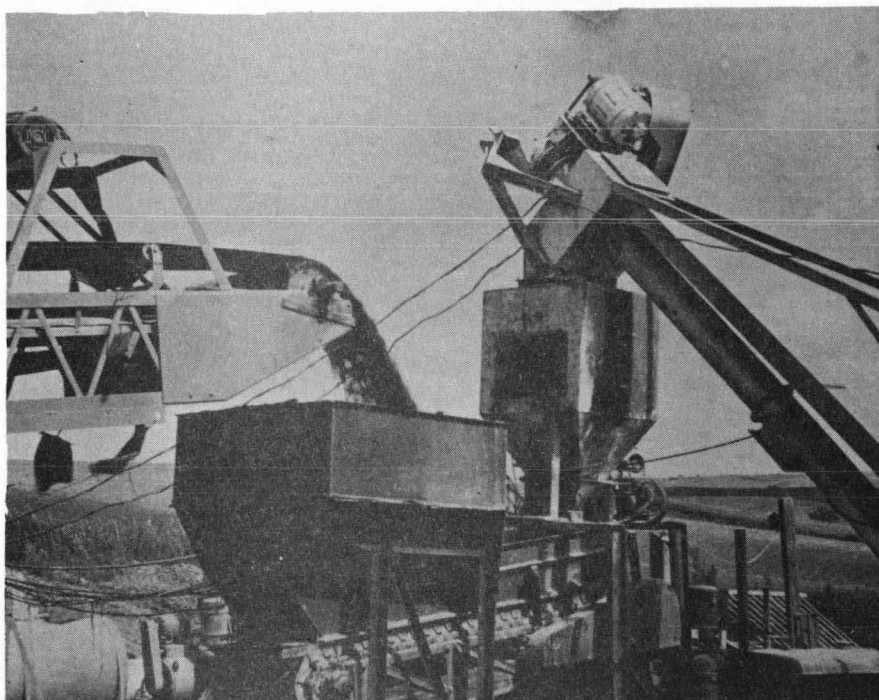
Soil being fed into a surge bin. Note cement hopper to the right.
